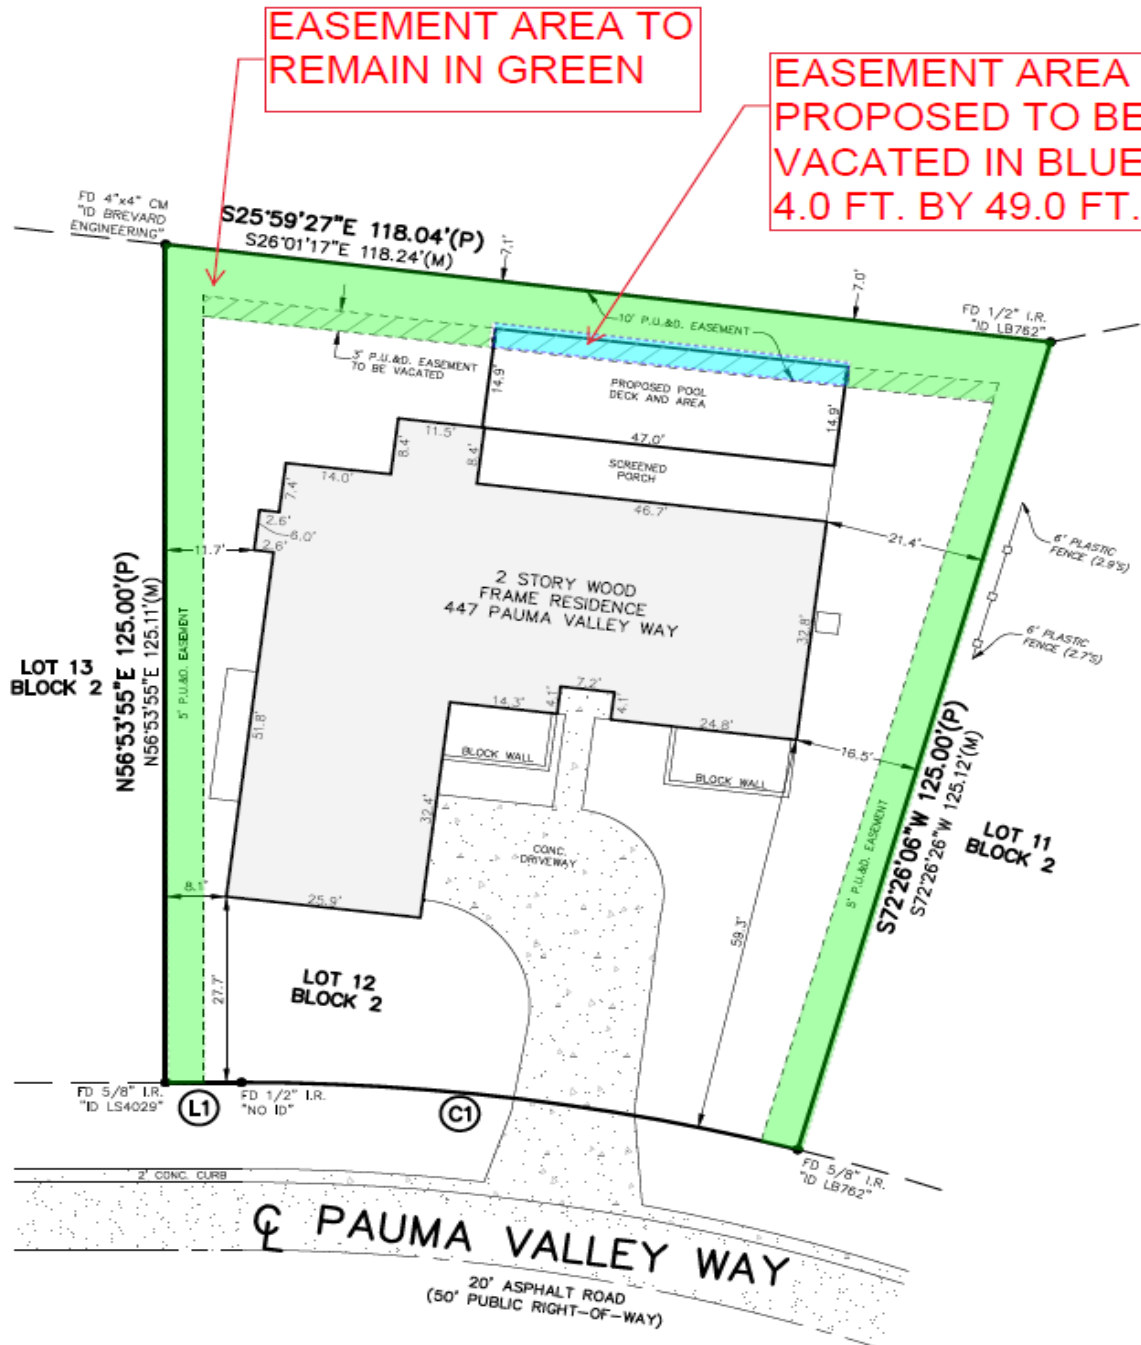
Copy of proposed pool plan 15 feet by 49 feet. Area highlighted in blue is proposed to be vacated to allow for construction of a pool. Area in green shows easement that will remain.
